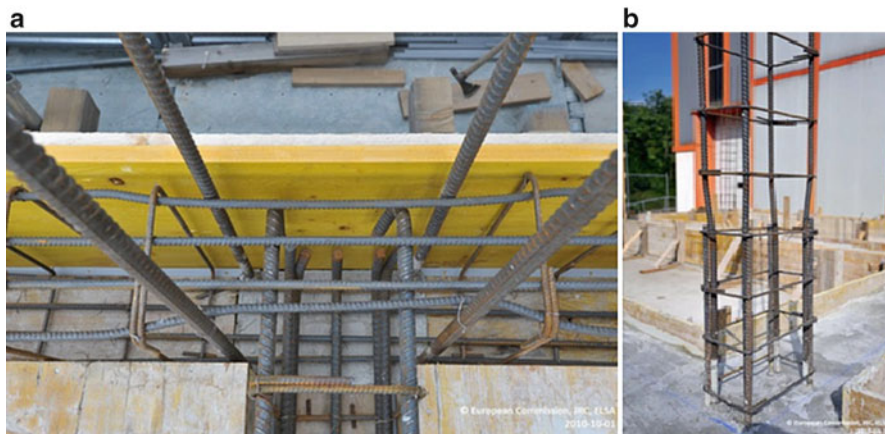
(a) Reinforcement details for beams, (b) Reinforcement details for columns
